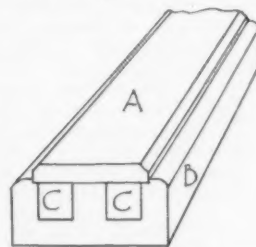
Moulding: A. Capping; B. Backing; C. Grooves for wire.
